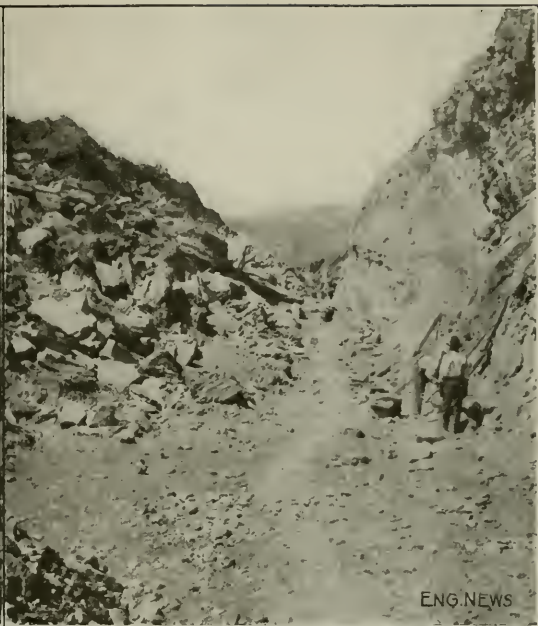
MAIN ST. CUT DURING CONSTRUCTION, LOOKING NORTH AT 26TH ST.
